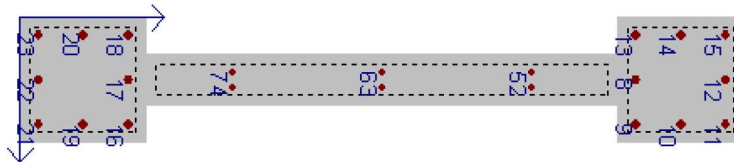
Vertical reinforcement arrangement used RC-Section Model
